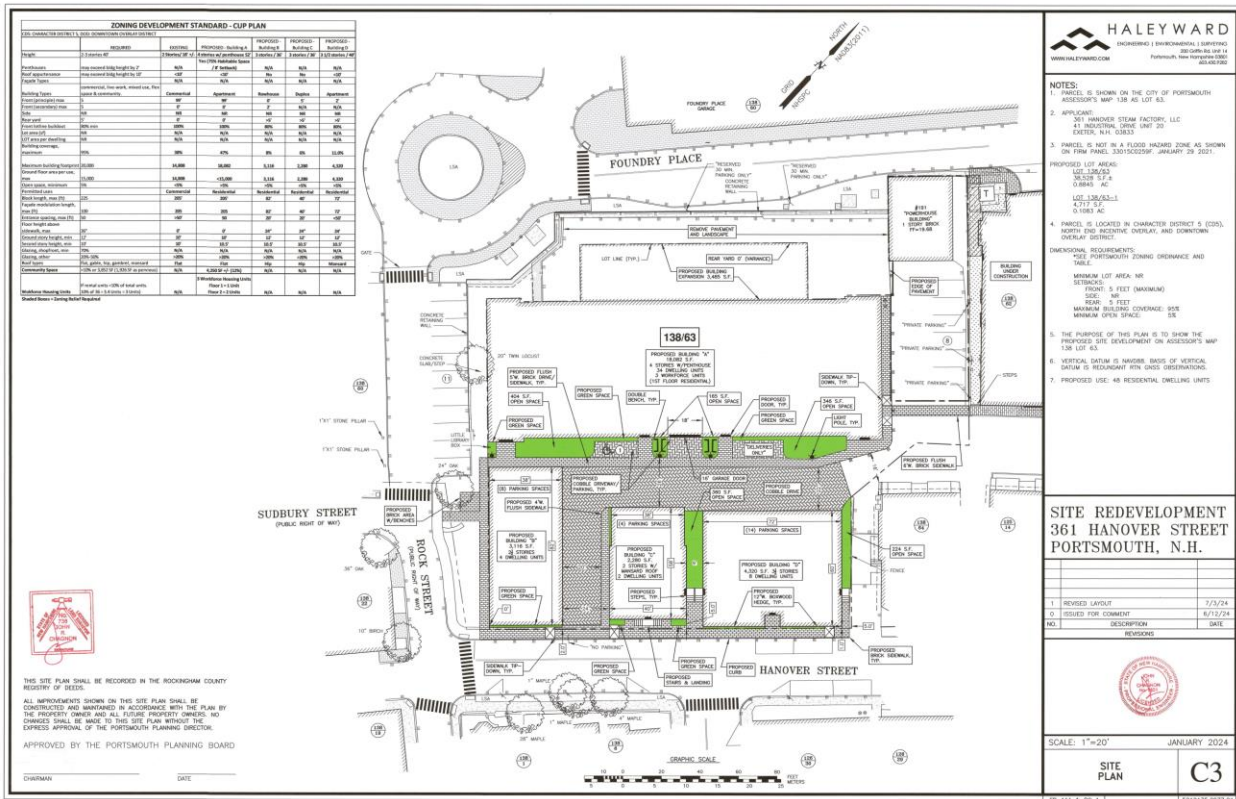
Alternative CUP Plan showing Proposed Buildings and Driveways and Open Space
